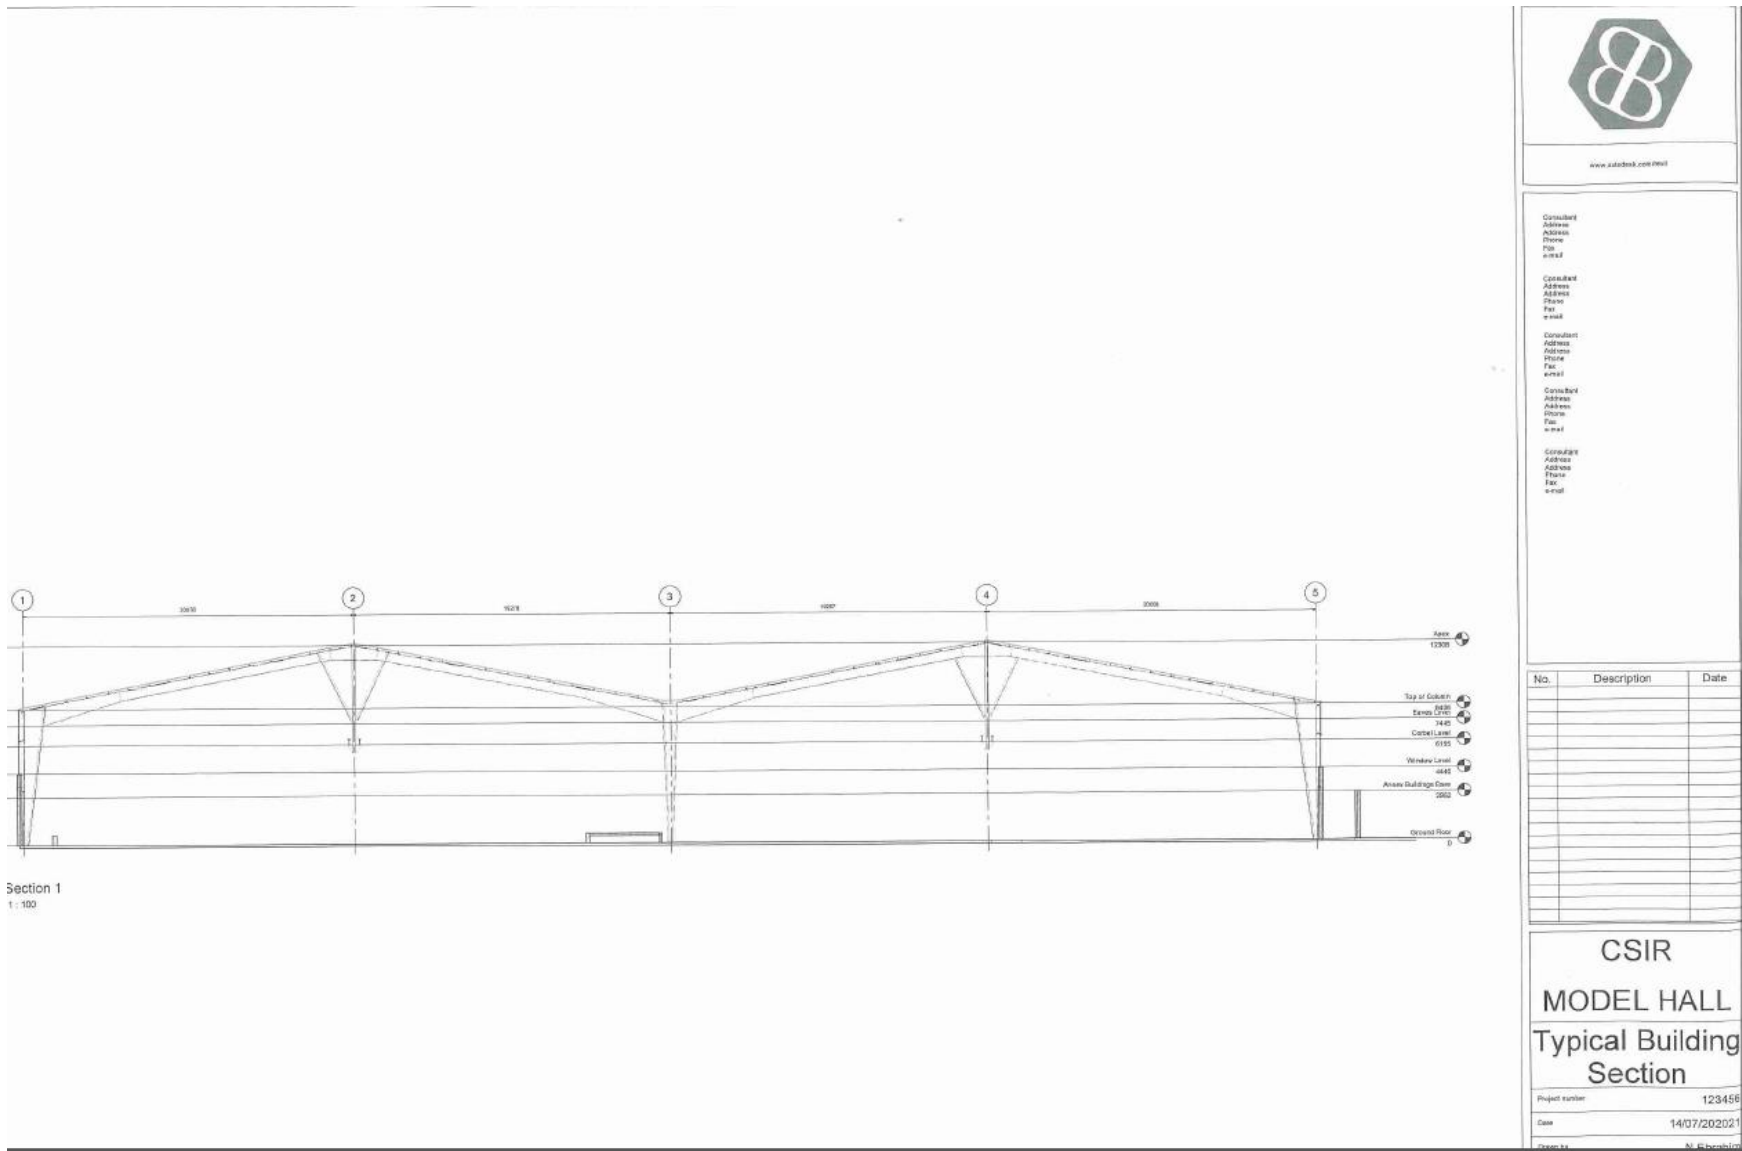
Building section and elevation extract indicating glazing height of 4m.
